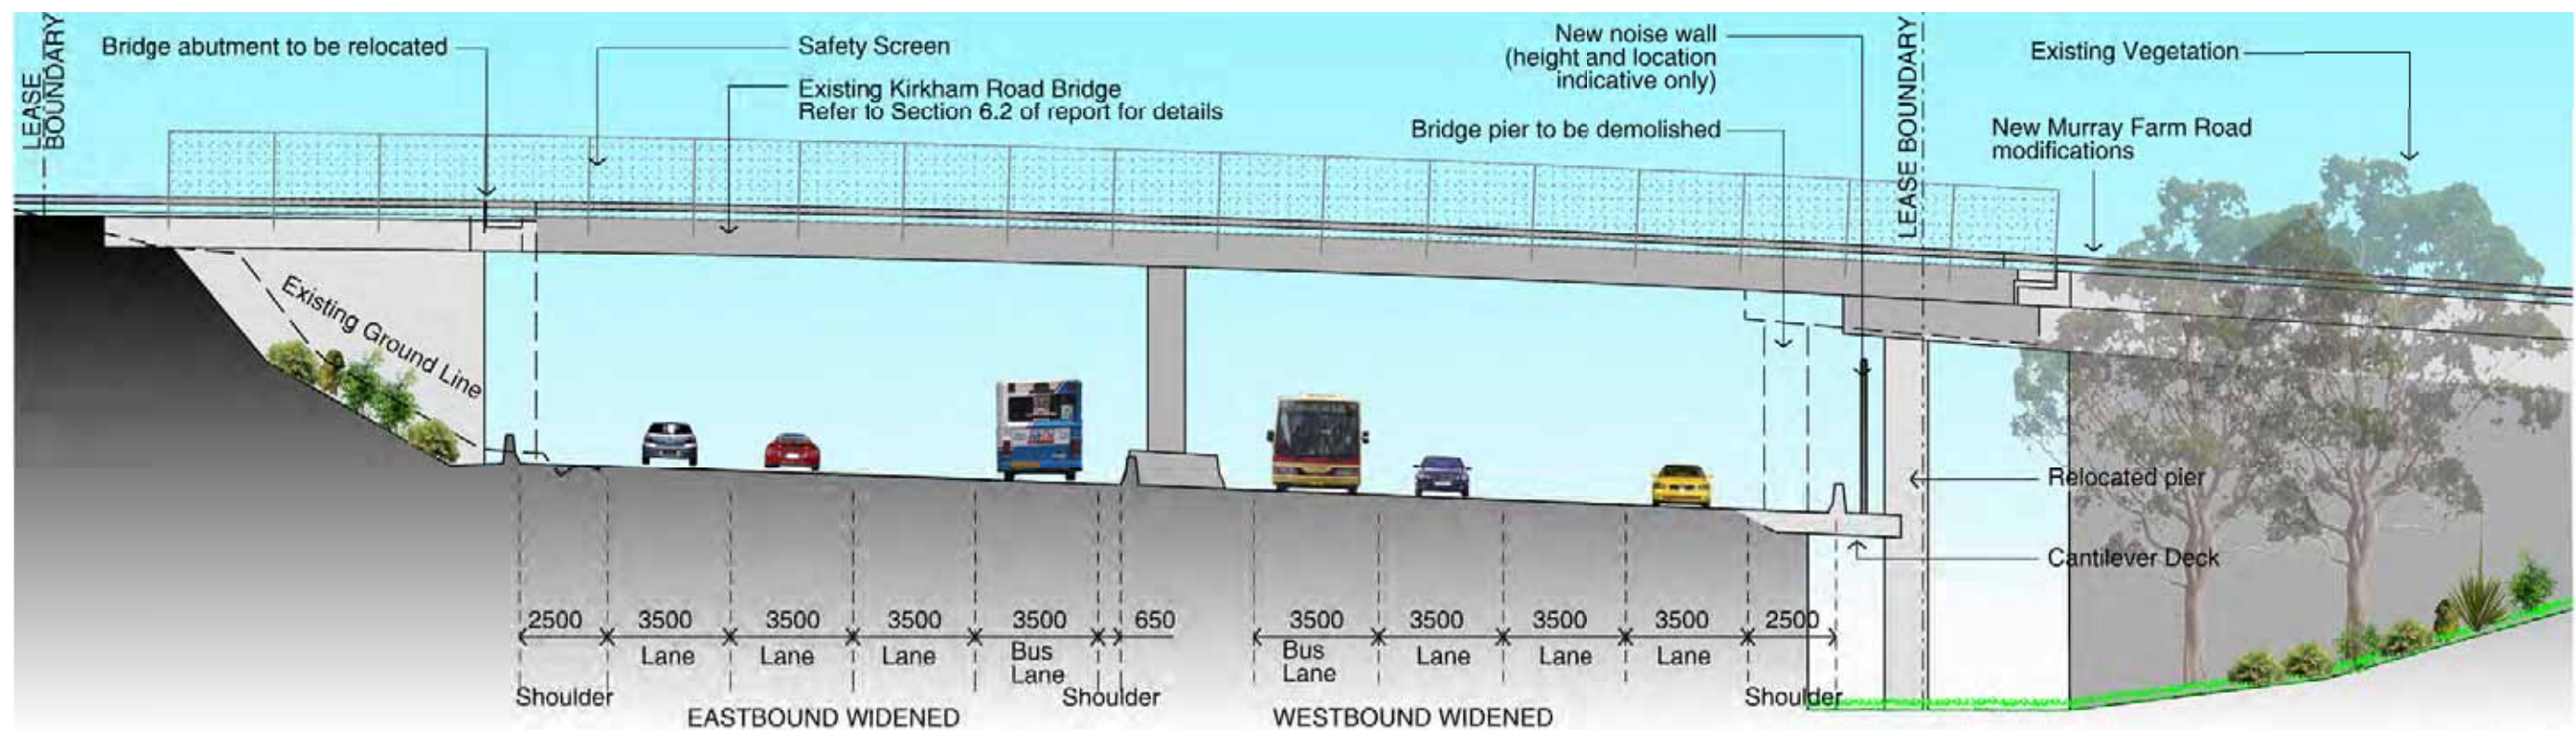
Stn 10600 Kirkham Street Bridge Area - Proposed
